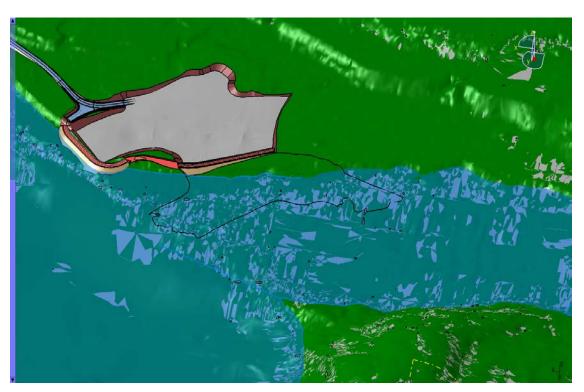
Road to Site Complete/ Ready for Bulk Excavation
